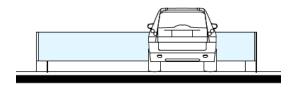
Proposed east elevation. Extract from drawing number: 1610/P-102
